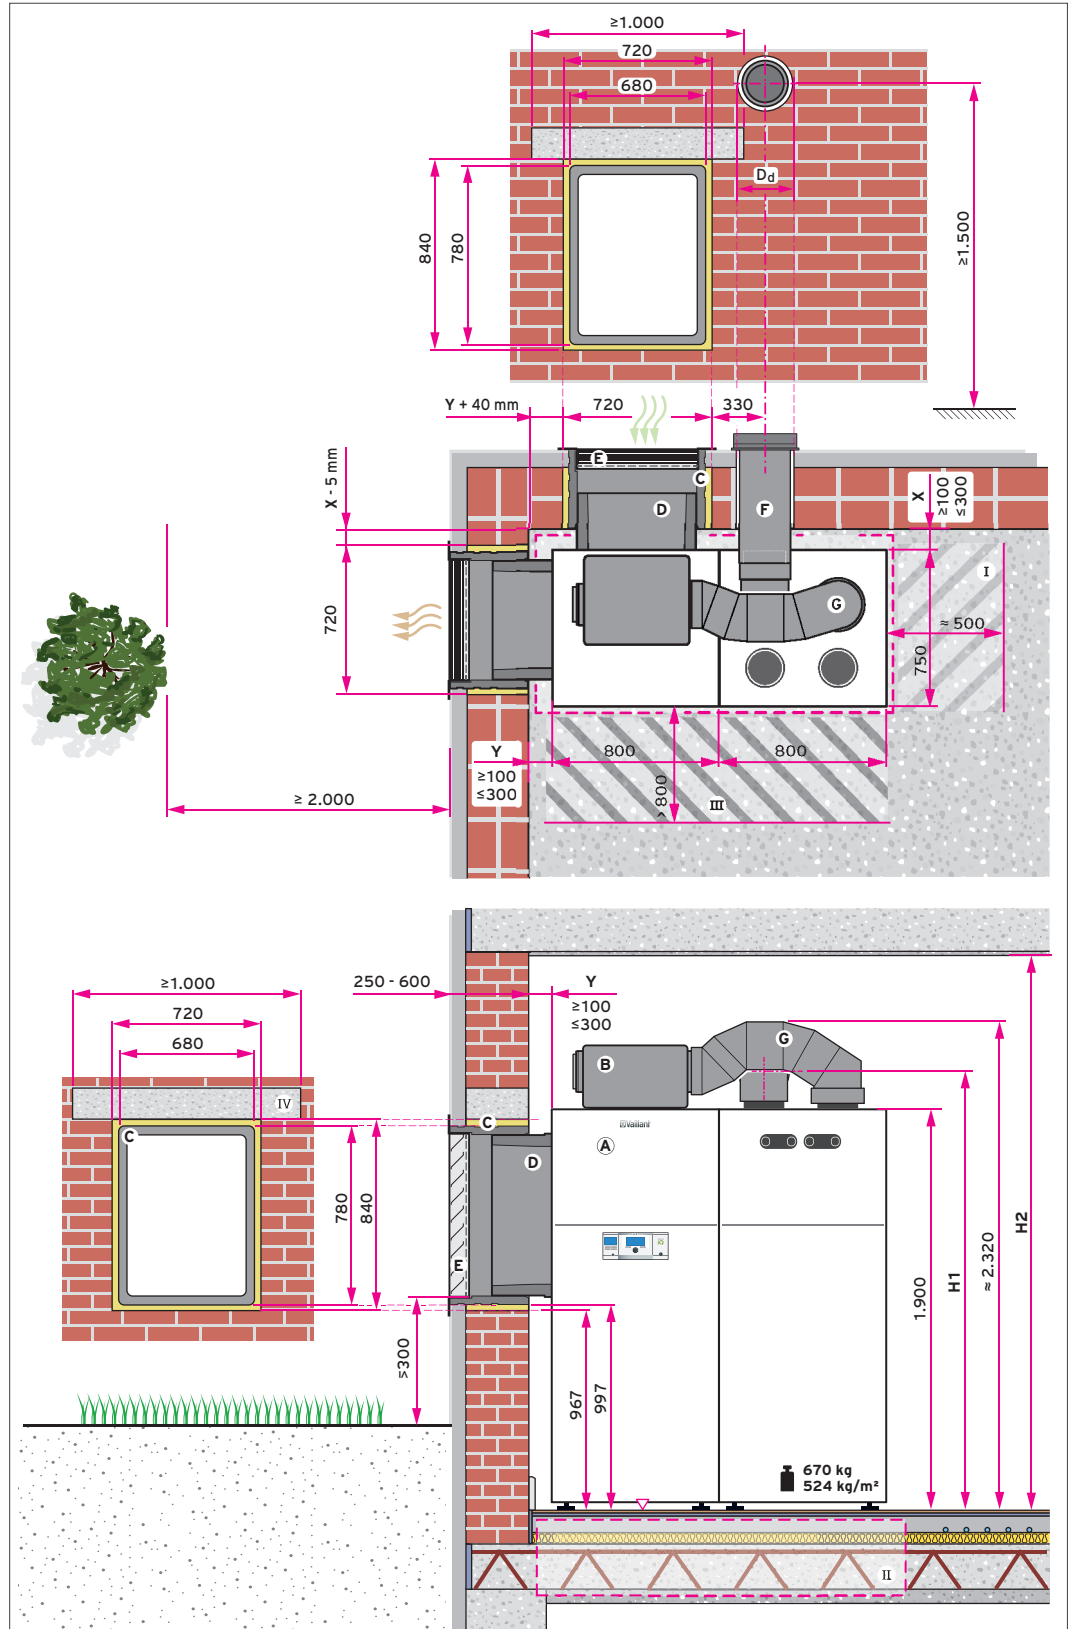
recoCOMPACT installation situation, ground floor - left-hand installation in the corner of a room
